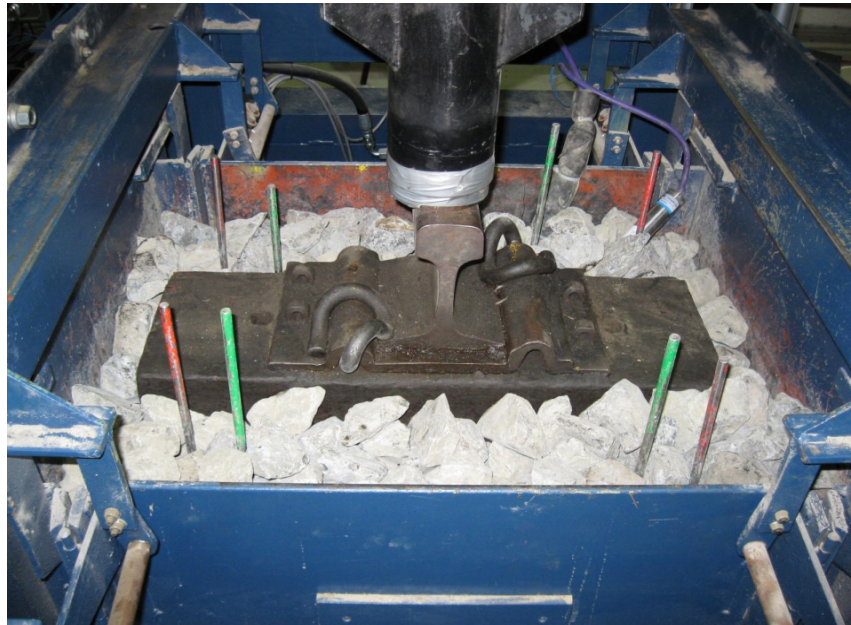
Plan view of the prepared ballast specimen ready for testing
